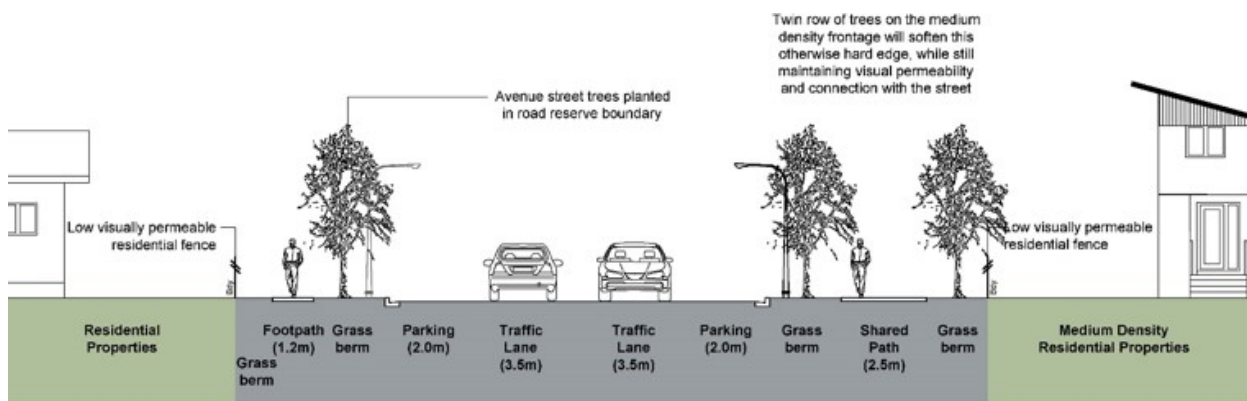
F: Cross section of Collector and Secondary Collector Roads in the General Residential Zone
